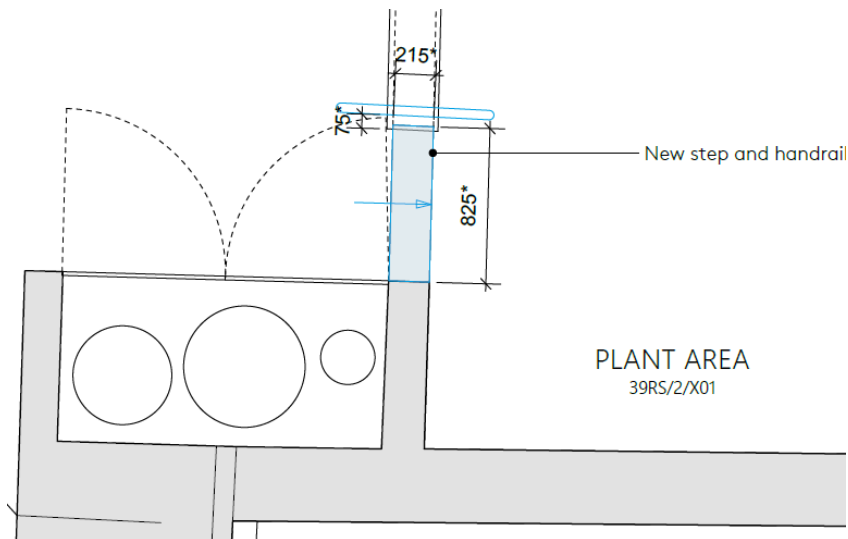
Proposed plan for new steps and handrail within yard of Science Block
